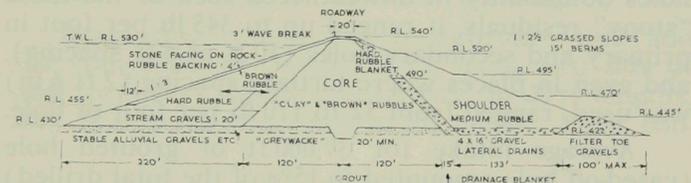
Upper Mangatawhiri dam, typical cross-section.
